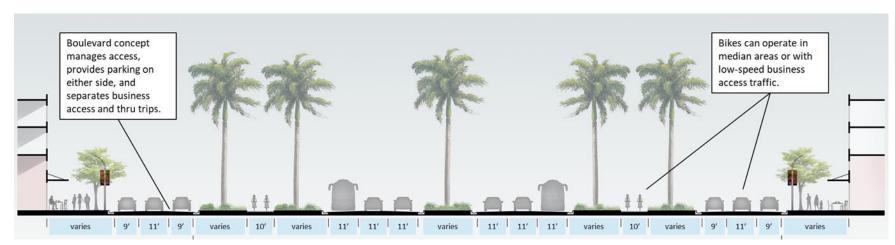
Proposed US 41 Cross Section – Naples Manor Area
